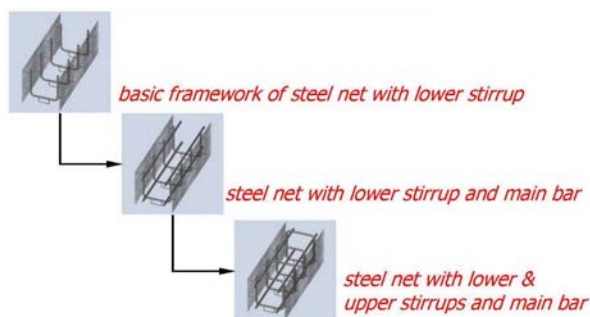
Pre-fabricated formwork system for concrete grillage construction
